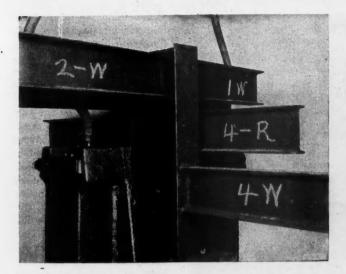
Vibration Test Piece Showing Arc Welded Connections.
